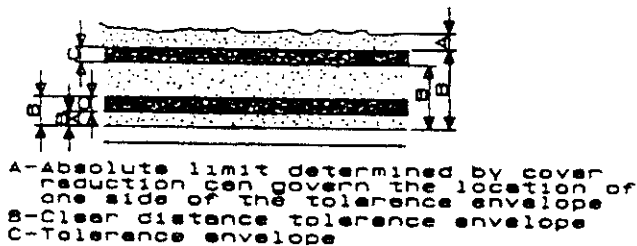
(b) and 2.2.3(b)—Reinforcement placement
